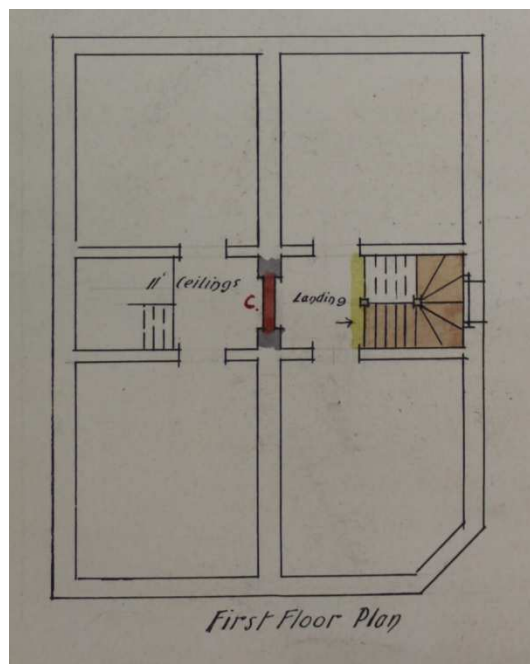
MCC Building Permit application 947 showing the schematic first floor layout in c1917 with new stair (VPRO)
